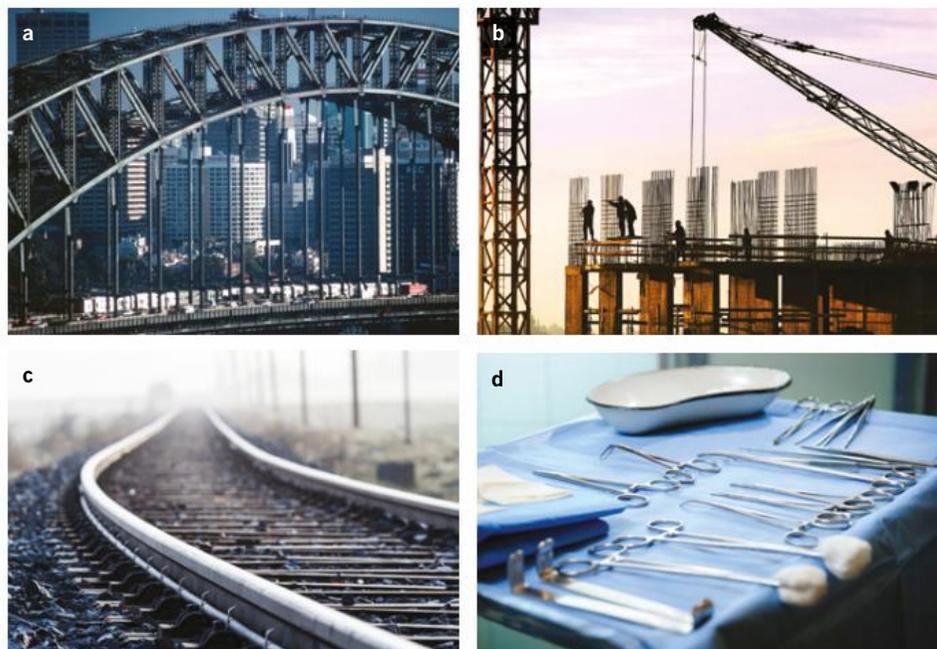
Steel is used in (a) the Sydney Harbour Bridge, (b) building frames in construction, (c) train tracks and (d) surgical instruments.
